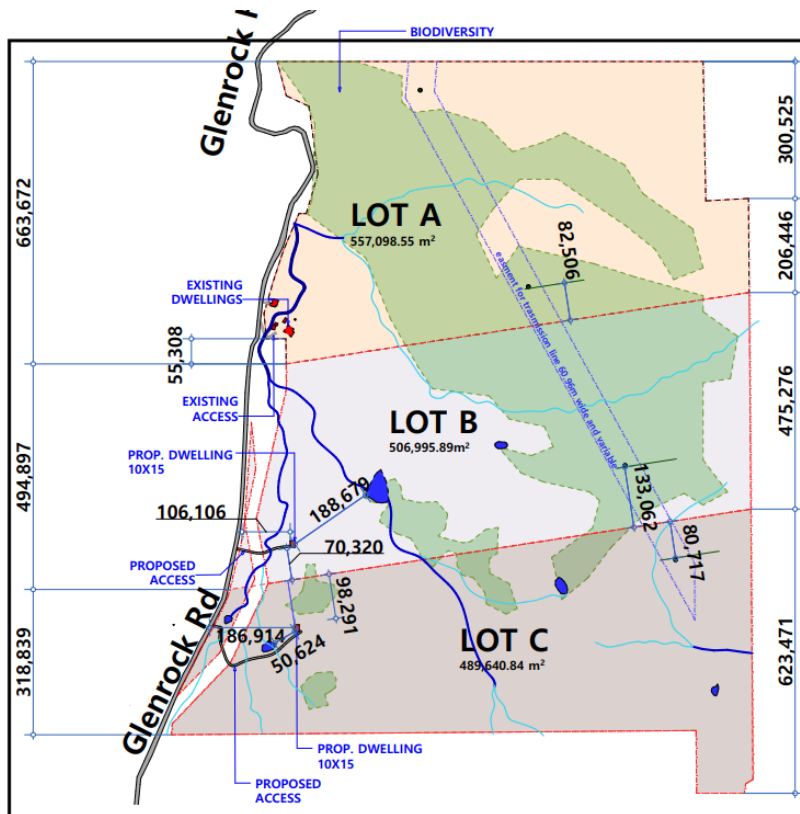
Proposed lot layout with indicative Building Areas– extract (refer to surveyed plans).
